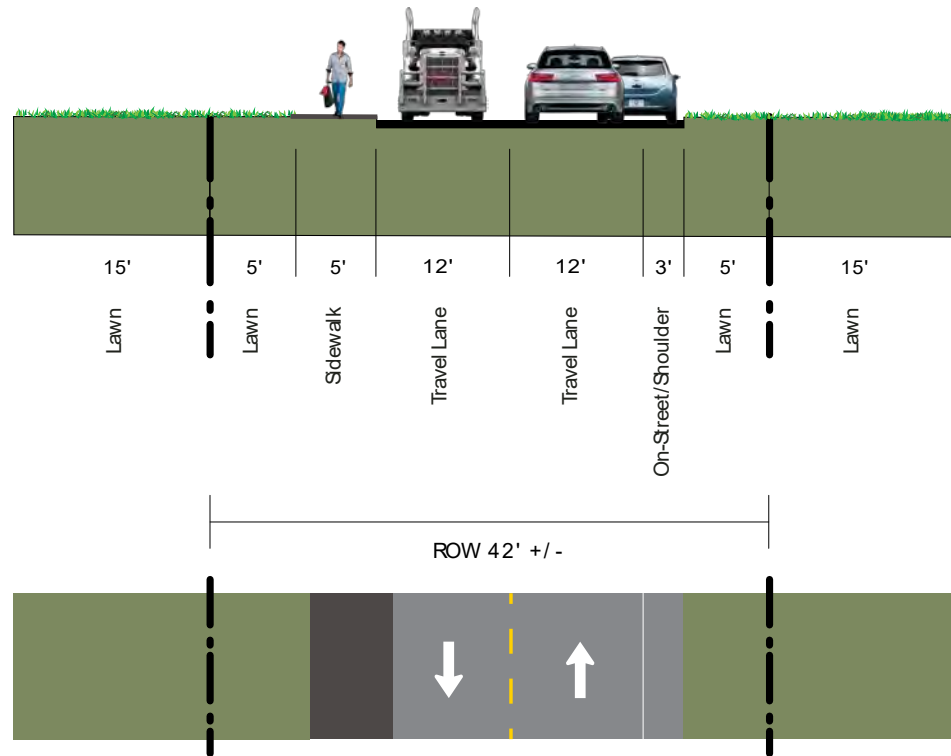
Government Street Existing Cross Section (two-way-segment)
